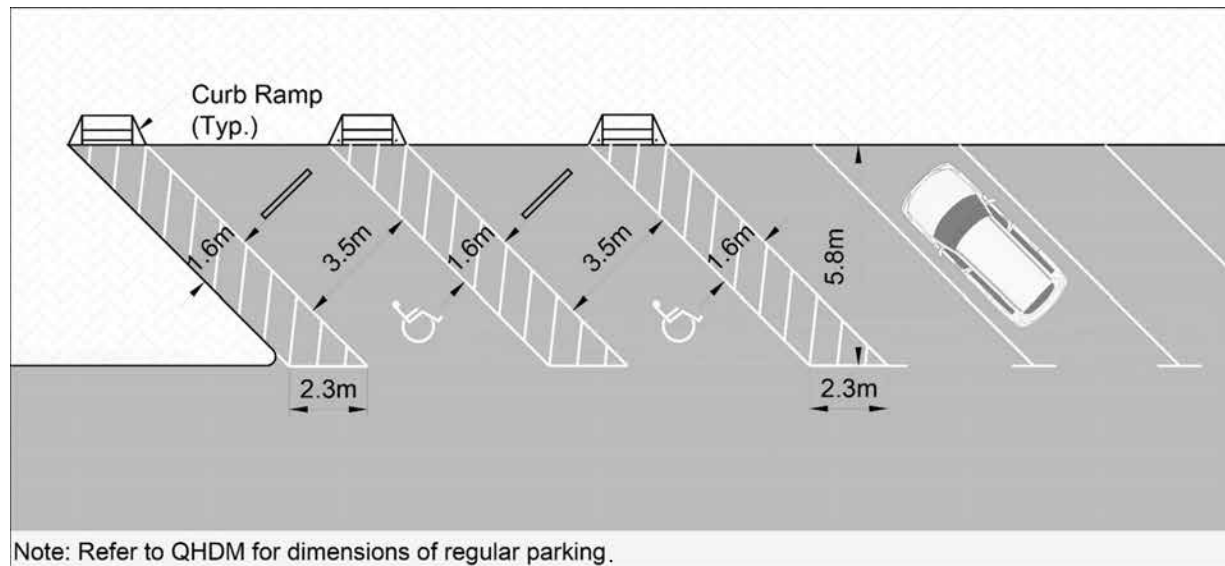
Forty-Five-Degree On-Street Accessible Parking Layout
